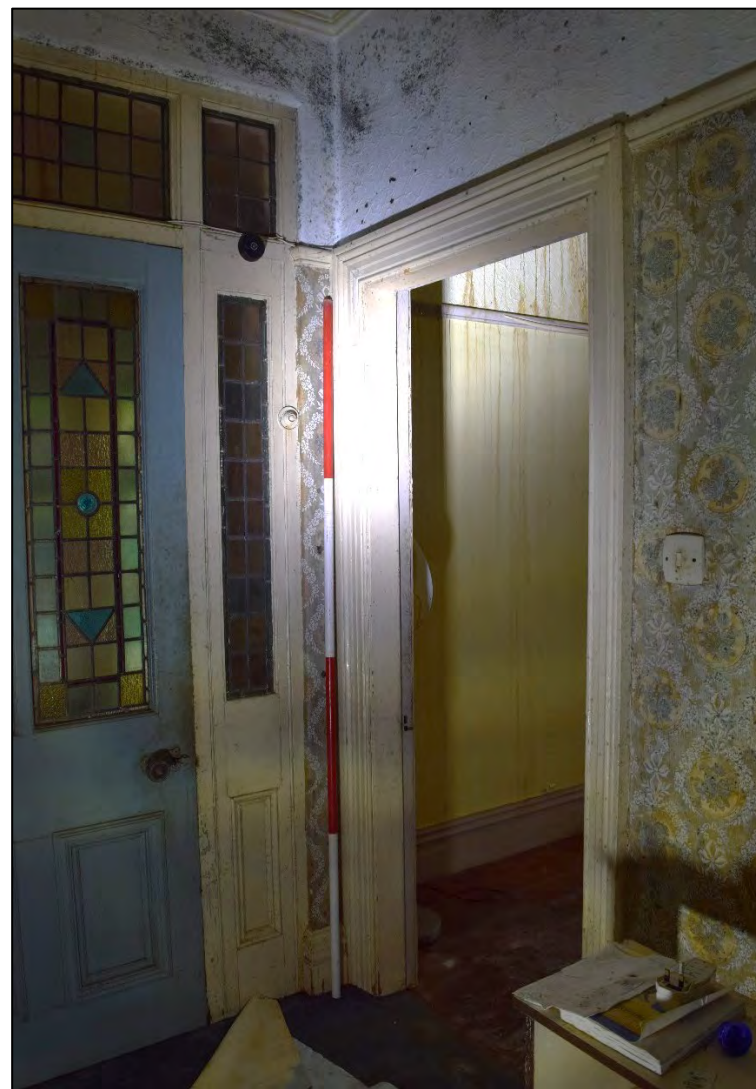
Door to Room 5 from the hallway, looking north-west. Scale 2m.
